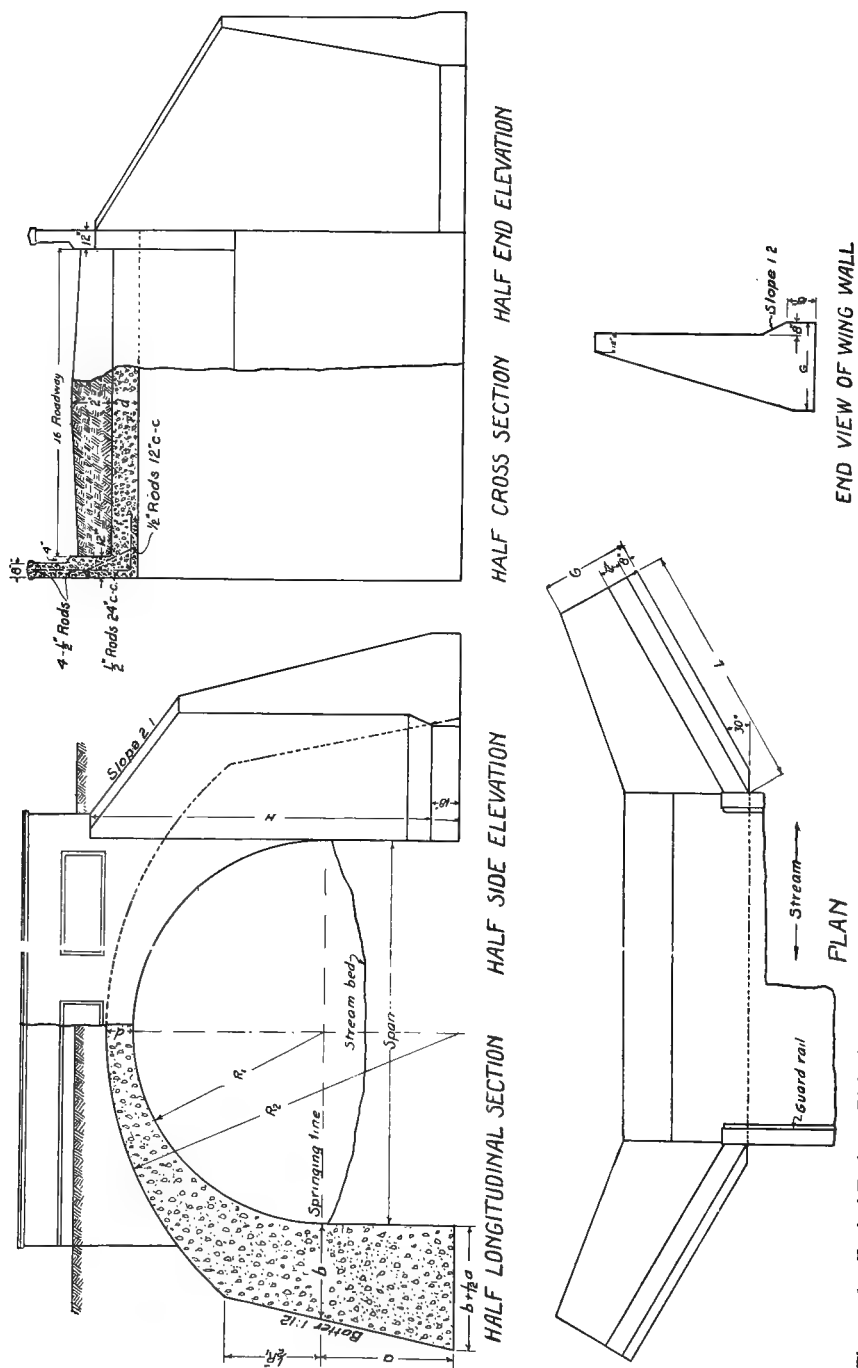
Typical Design. Plain Concrete Arch Bridge, 10 to 20 feet in span.
